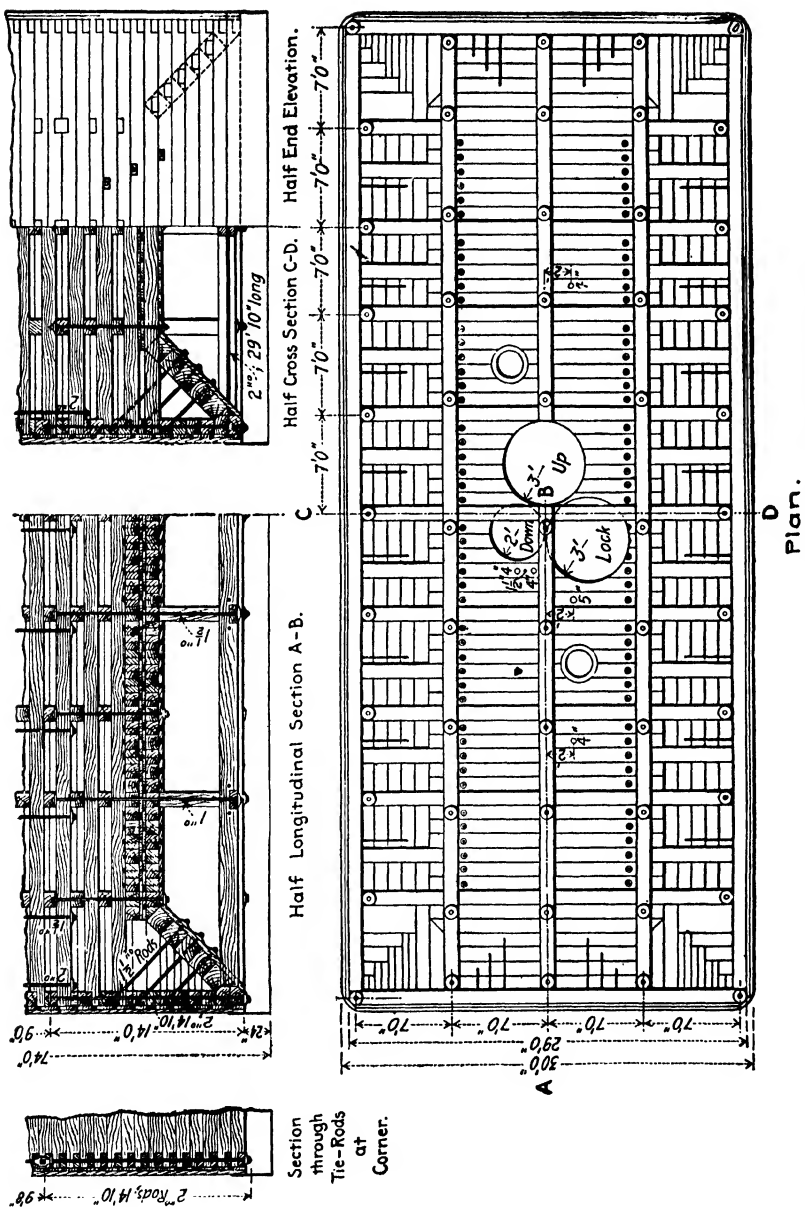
Pneumatic Caisson for Pier 4 of Bellefontaine Bridge. Designed in 1892.
